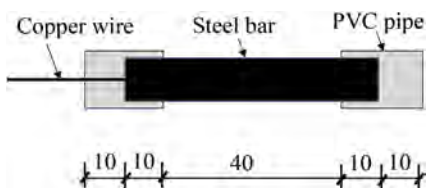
Steel rebar specimen for electrochemical corrosion test (unit: mm).
